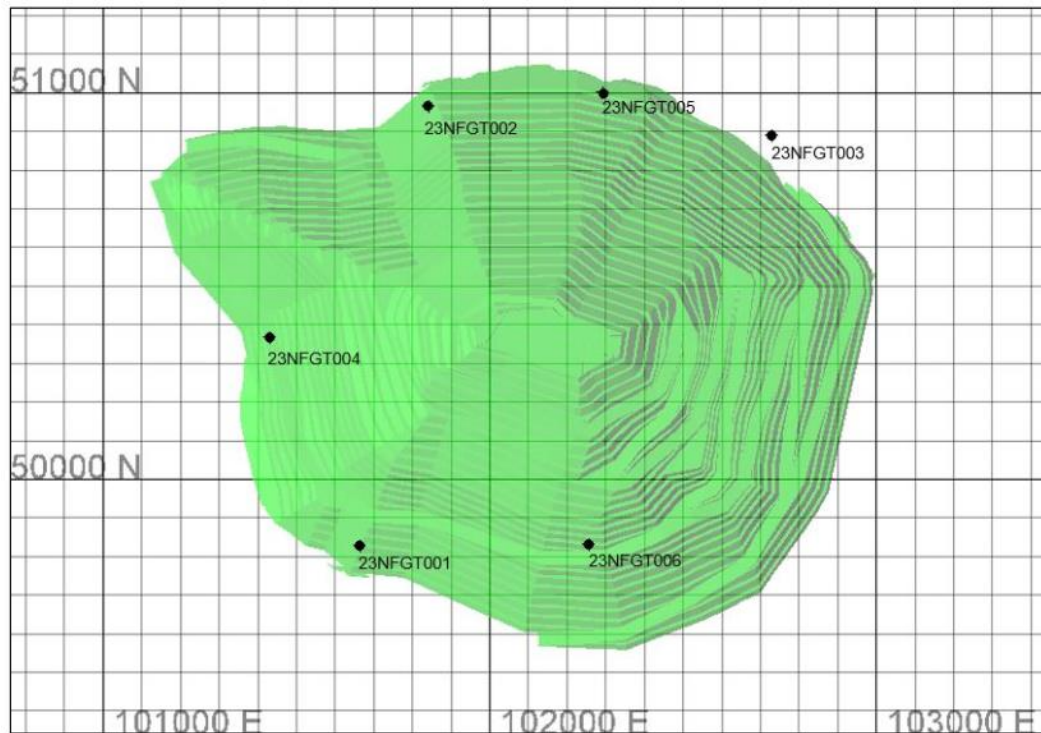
Geotechnical drill hole Locations (2023 drilling) (MEC 271100 CYM Geotechnical PFS – final V1.0)
